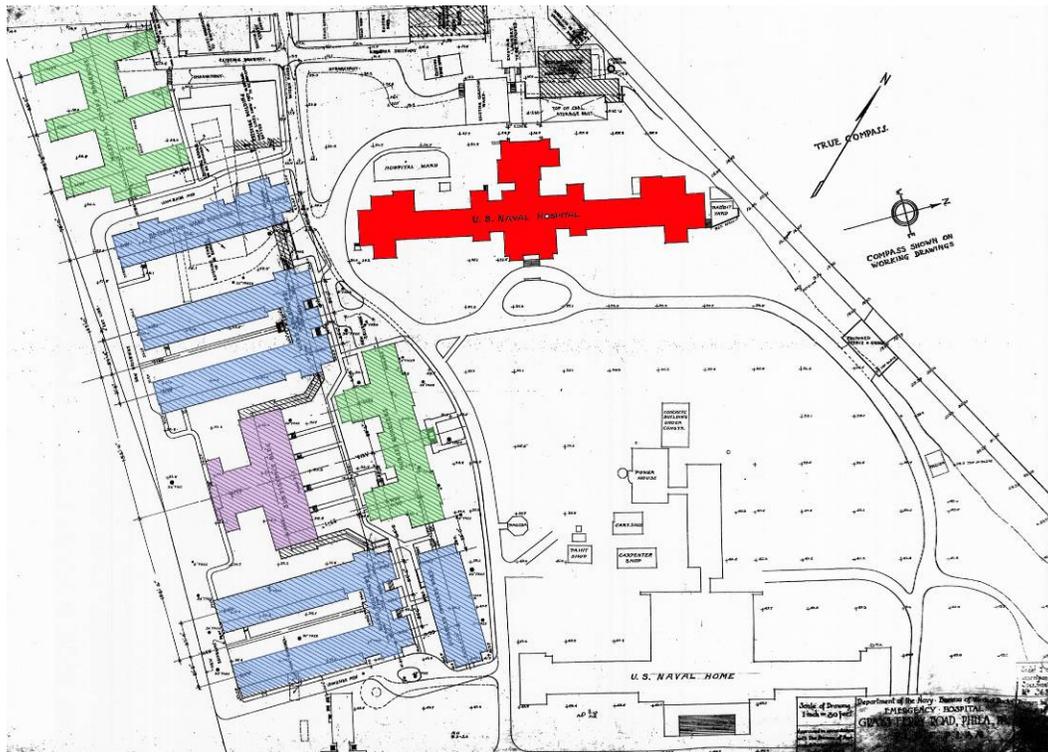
Site plan of the WWI temporary hospital addition to the Naval Hospital Philadelphia, Pennsylvania, June 1918 (NARA College Park, RG 71 427-31).
